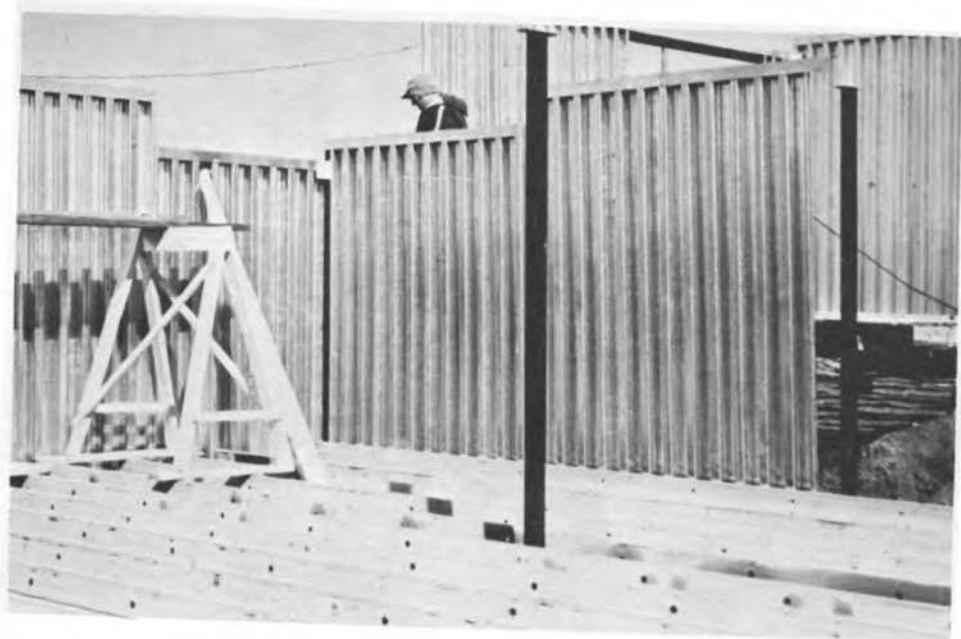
MARK IX SUSPENDED BASEMENT FLOOR JOISTS
